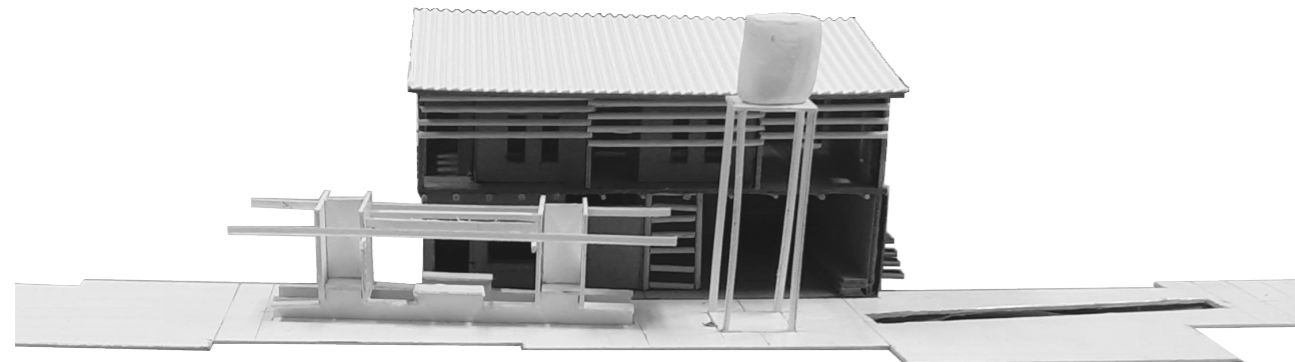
A maquette of a dwelling and the streetscape (Author 2022)
